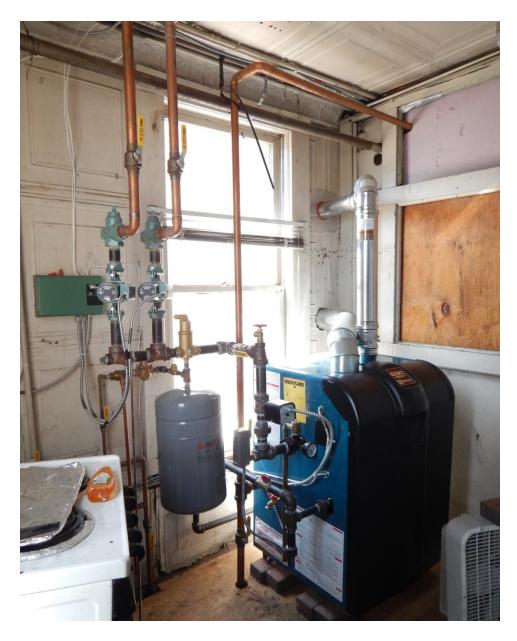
FIRST FLOOR MECHANICAL ROOM FACING SOUTHWEST
